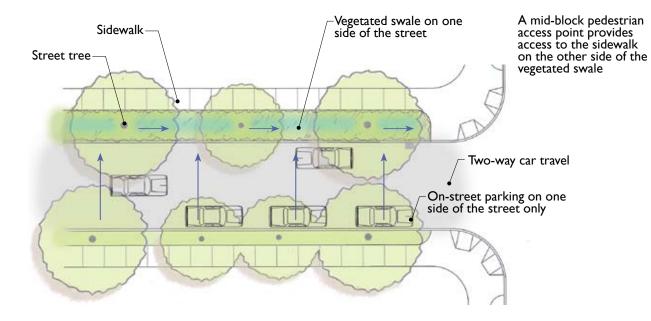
Swale on One Side of Street, Parking on Other Side-Plan View View
